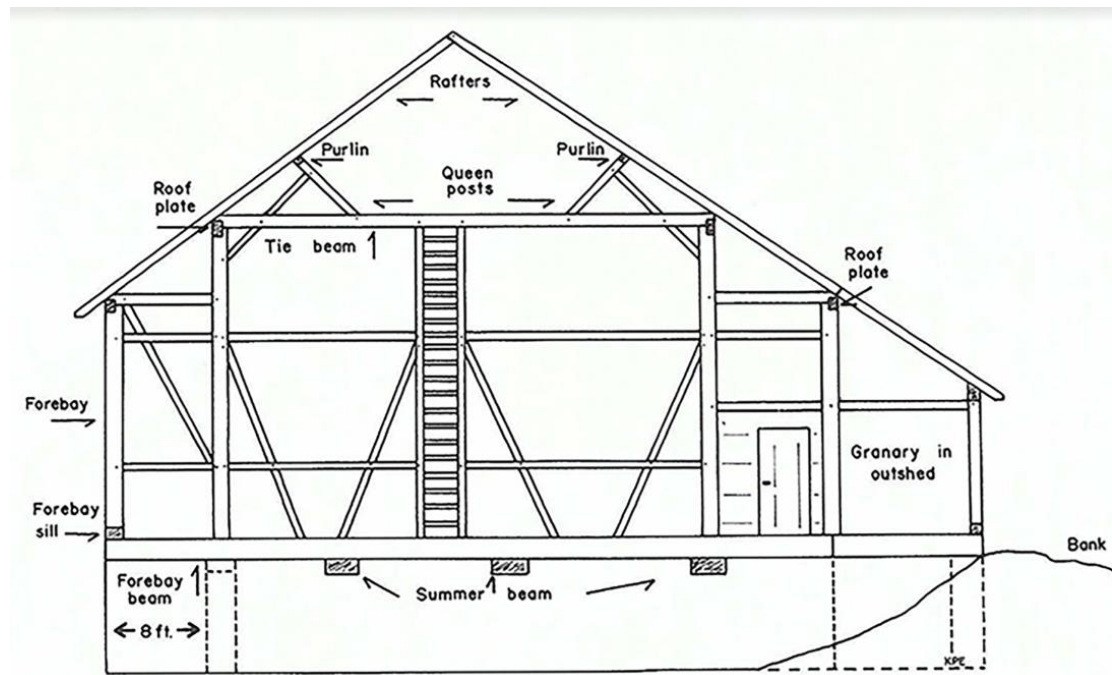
Framing plan of a “Bank Barn” (Ensminger, *The Pennsylvania Barn*).
